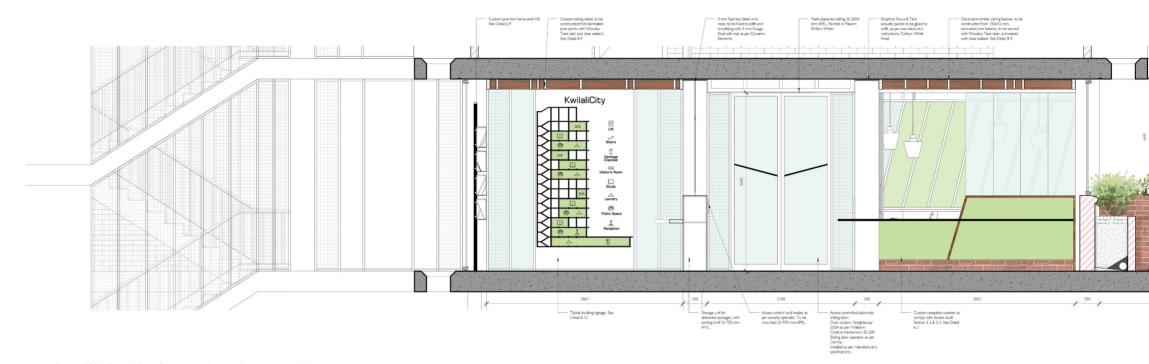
Ground Floor Section A-A (, by Author, not to scale)
